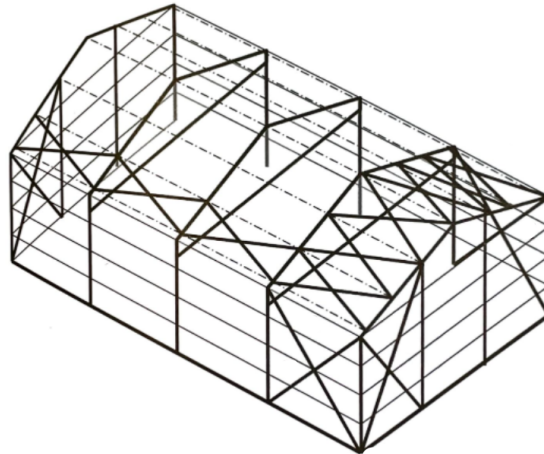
Industrial facility stabilised by truss system in both roof and wall (Source: [2], edited).
